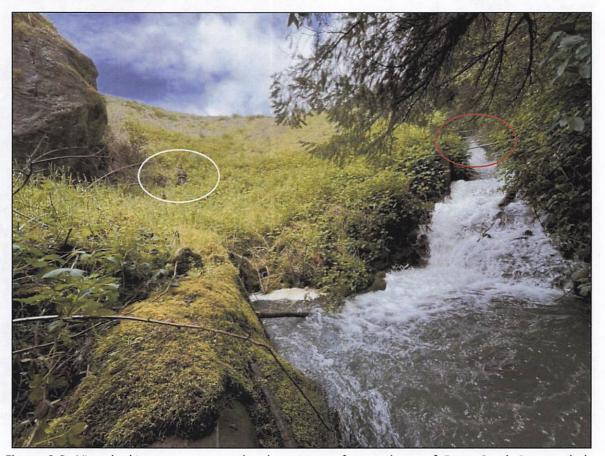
View looking upstream at the downstream face and toe of Ferry Creek Dam and the downstream end of the spillway. The metal struts in the spillway are marked with a red circle. The large moss-covered, outlet pipe is visible in the foreground, and additional pipe infrastructure is circled in white. The bimrock is visible on top left. Photo taken May 9, 2022.
